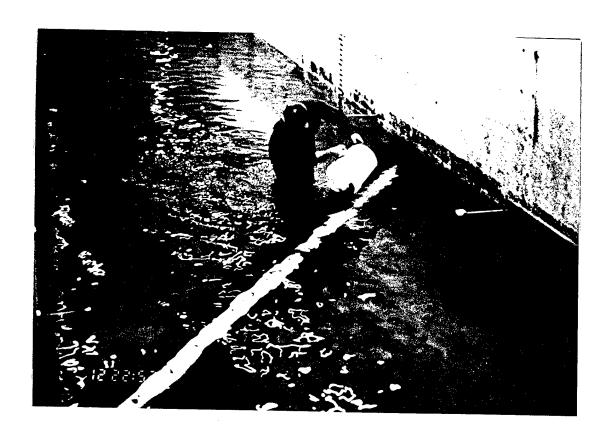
Placing of Armor Stone Design Mix Through Water
